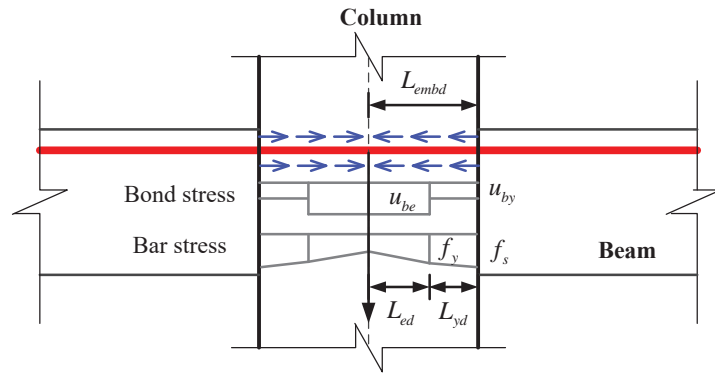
Joint2D element for precast sub-assembly under progressive collapse
